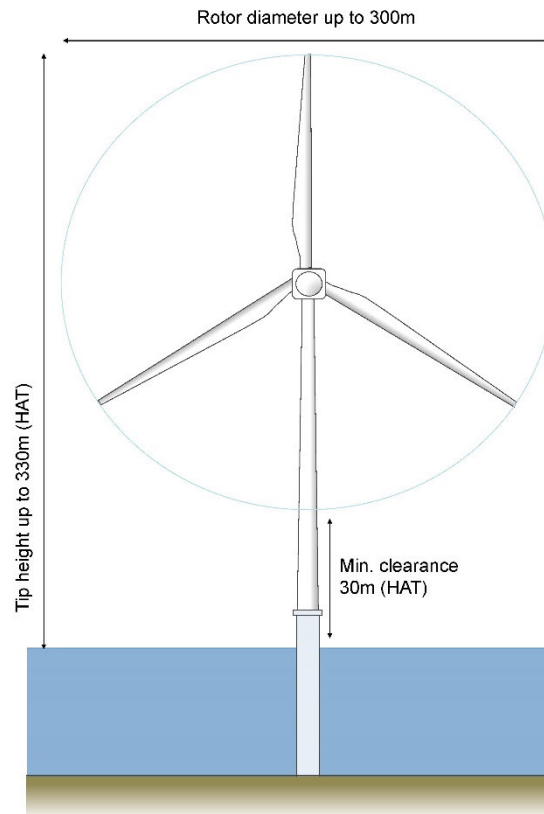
Wind turbine schematic with key maximum dimensions & minimum clearance
